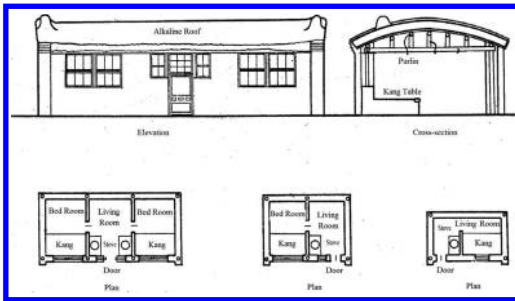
Elevation, cross-section and plan of typical alkaline soil dwelling.
